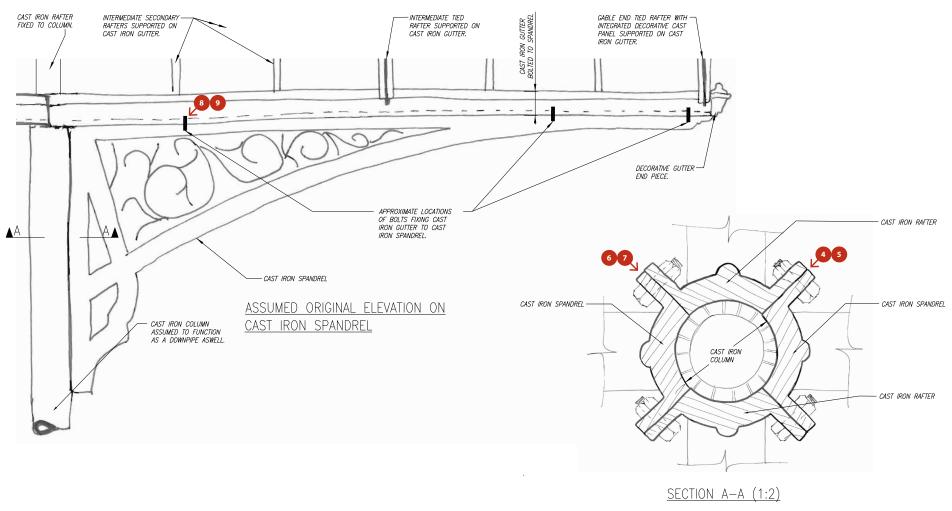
Key plan showing location of detail photos of canopy bracket located in bay 4 on platform 2
